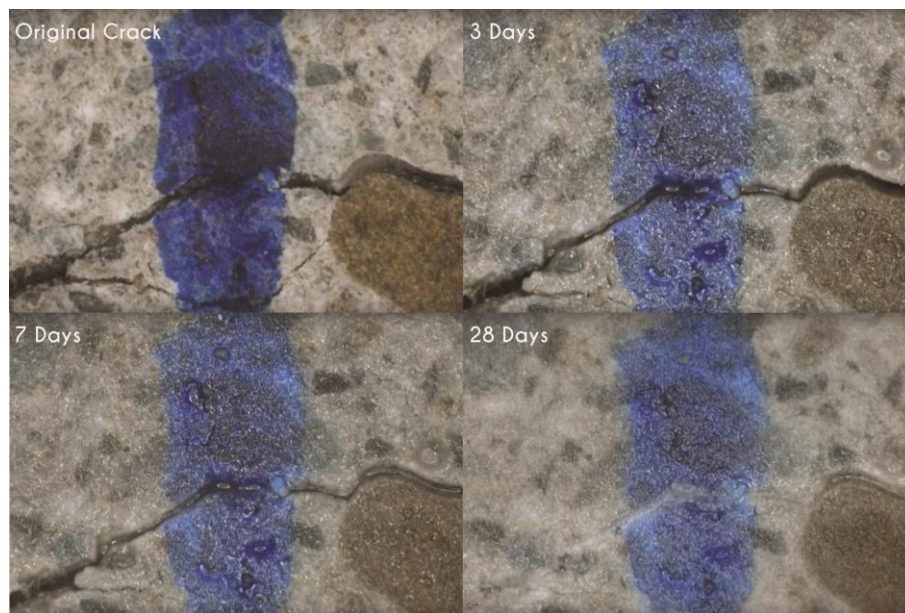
Example of BioConcrete producing limestone to repair a crack (image source: Jonkers, 2010)
